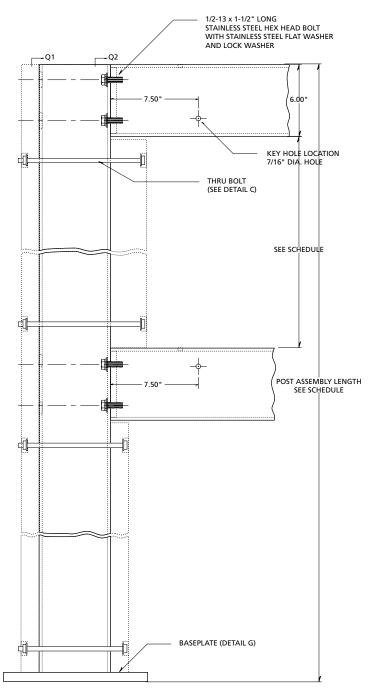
DETAIL POST ASSEMBLY 6 x 4 PLAN VIEW
